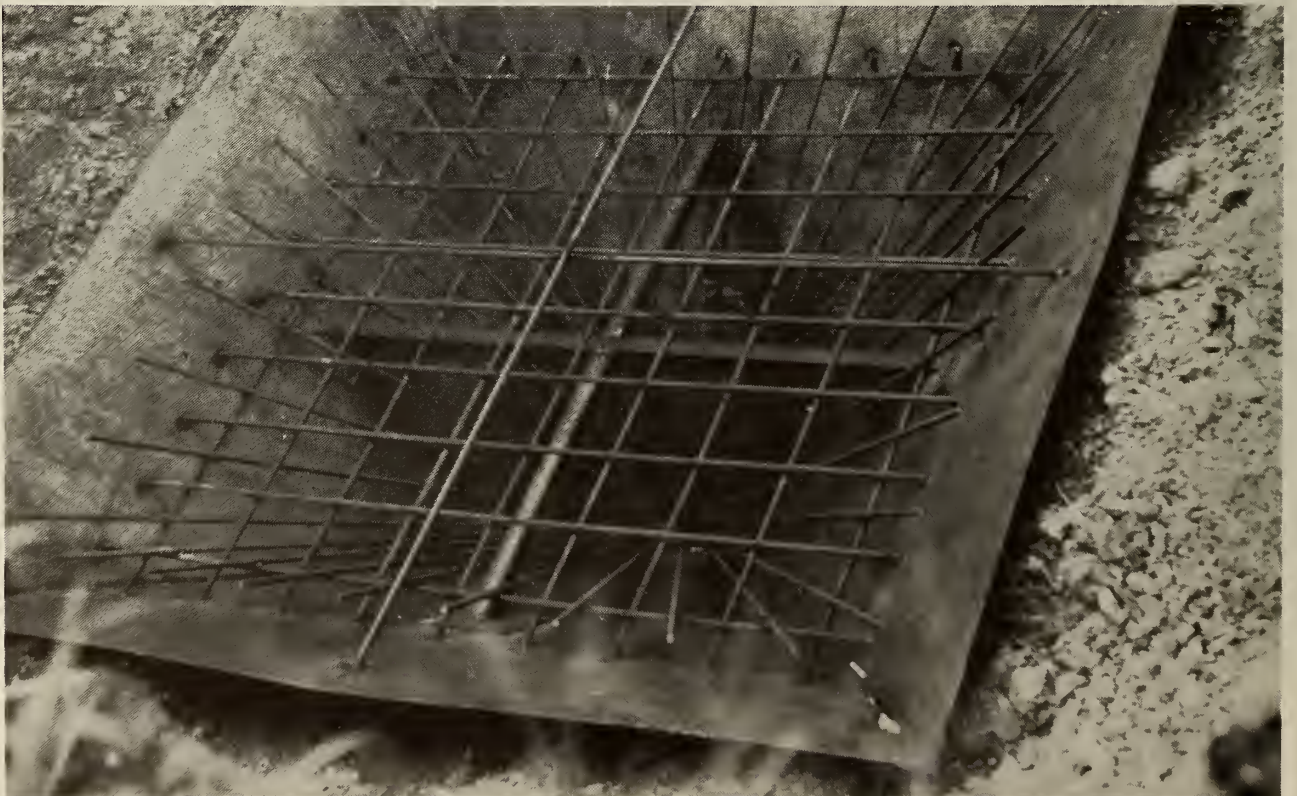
12-ft form showing I-beams and position of horizontal and vertical reinforcing bars.
